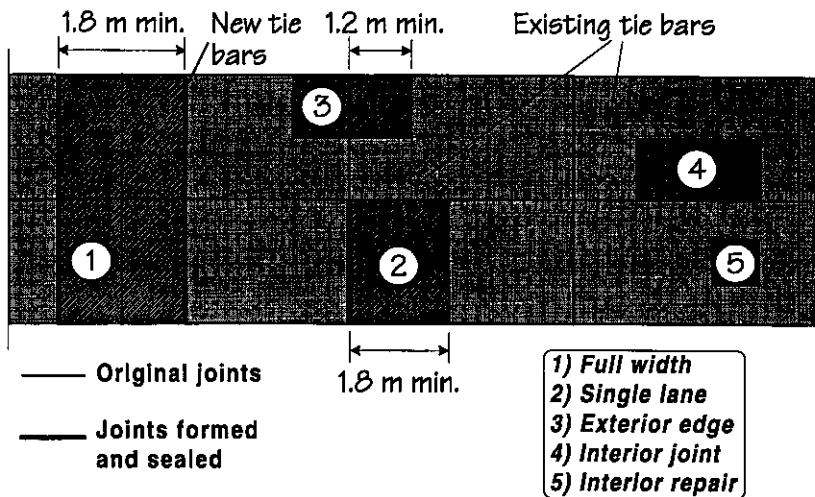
Repair Section Layouts in Plain Concrete Pavement
